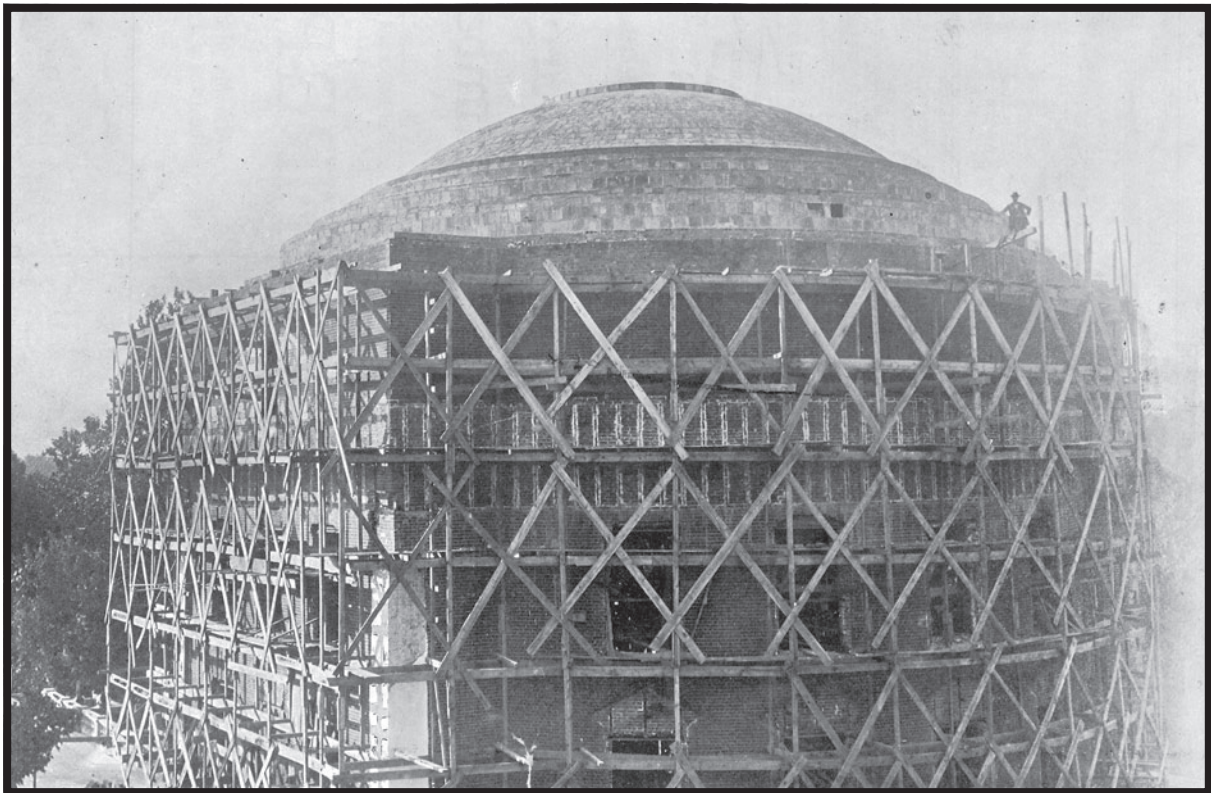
The Rotunda under construction, from an advertisement for R. Guastavino in the November 7, 1896, issue of The American Architect and Building News.
